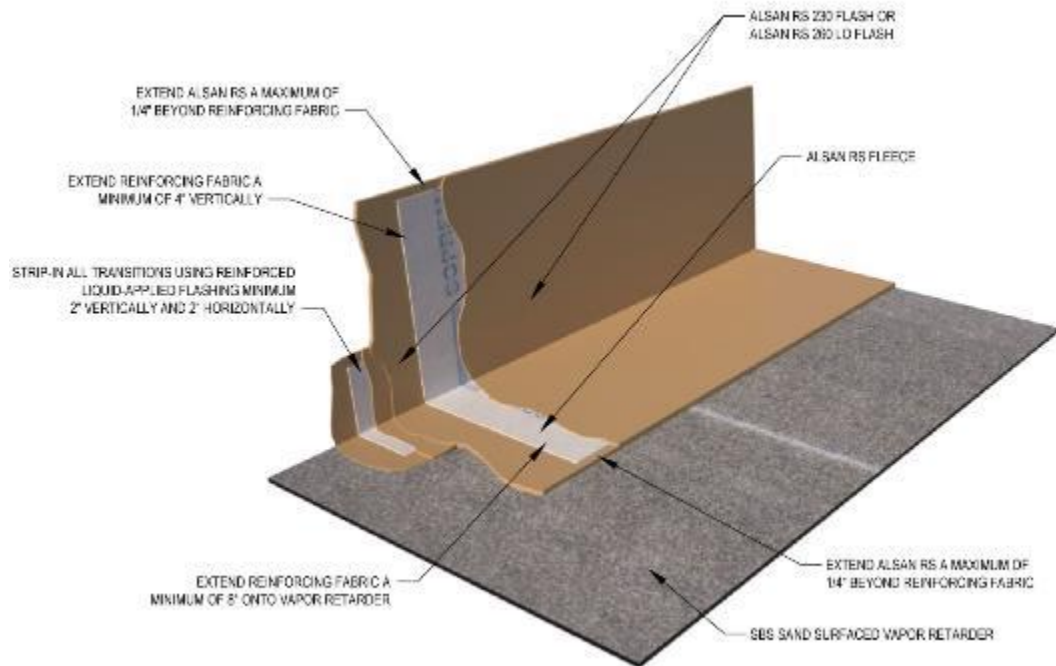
ALSAN® RS Wall/Curb Flashing on Vapor Retarder
